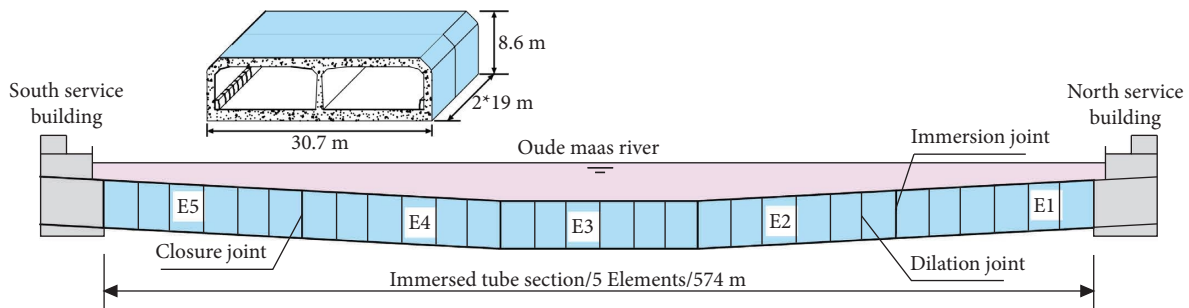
Longitudinal profile of the Heinenoordtunnel.
